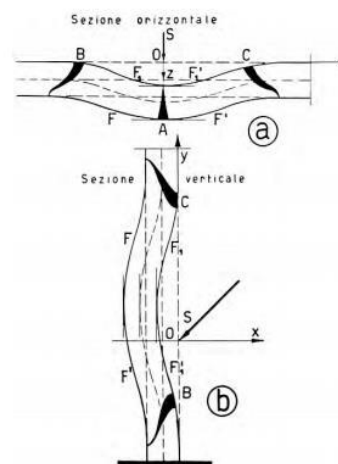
Crack pattern in a wall in case of an inclined point load (Mastrodicasa, 1943).
